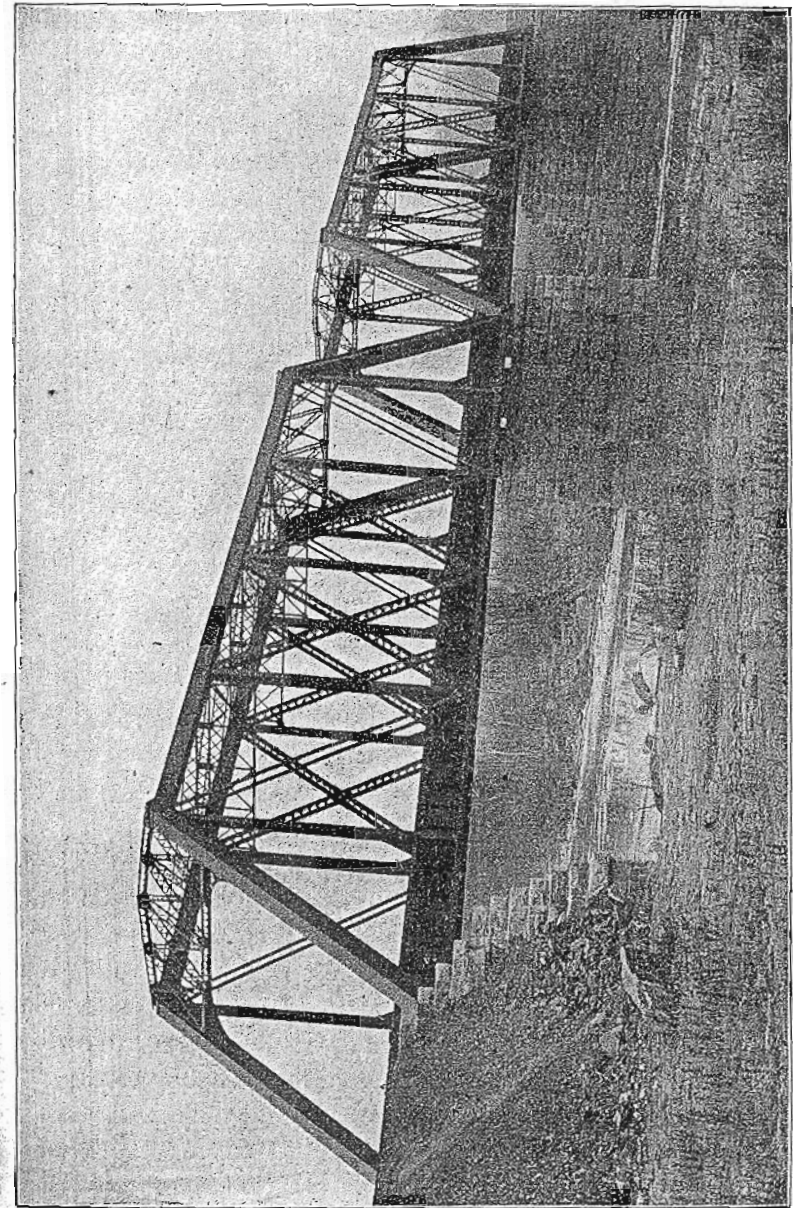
Baltimore and Ohio Railroad Bridge crossing South Branch of Potomac River in West Virginia
